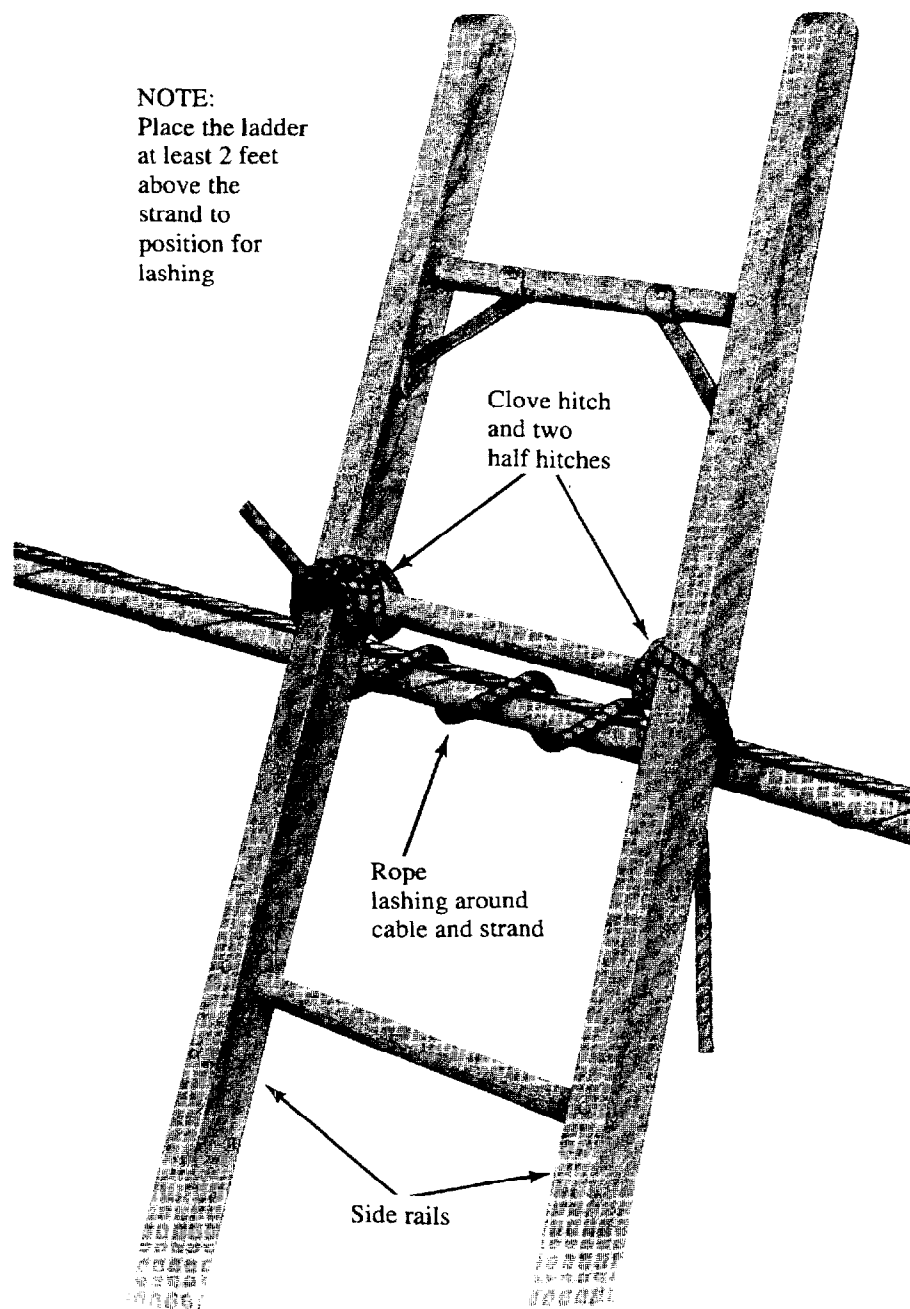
Lashing Ladder to Strand, Using Lashing Rope
